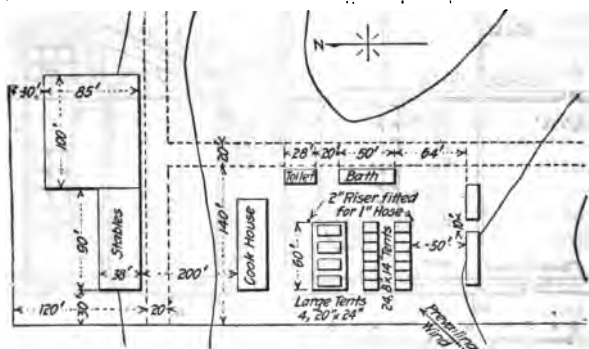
General Layout of Construction Camp for Town of Torrance, Cal.
